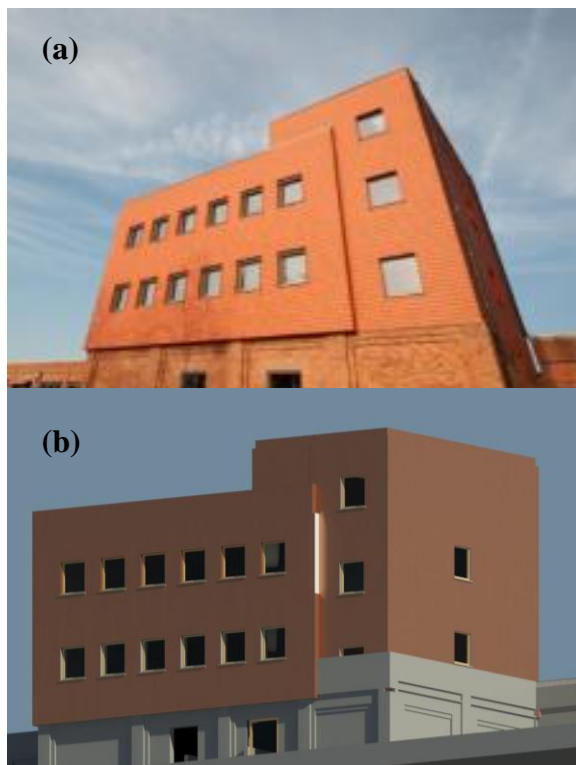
(a): Test facility, (b) 3D rendering of the BIM model
